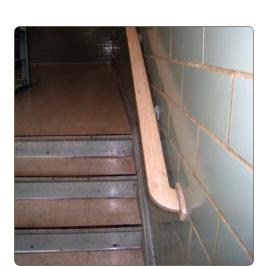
The handrail design is too close to the wall and does not meet code.
